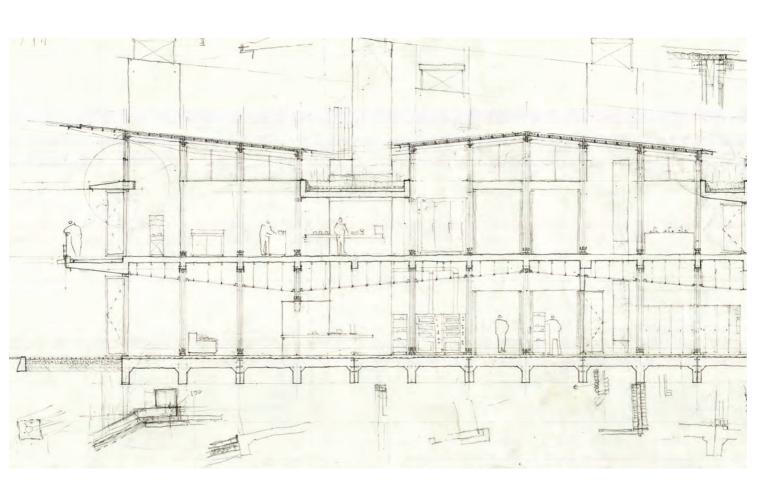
Section through machine viewing space, circulation hall and baking space facing West. Section was used as first exploration in technical development (Author 2014).
